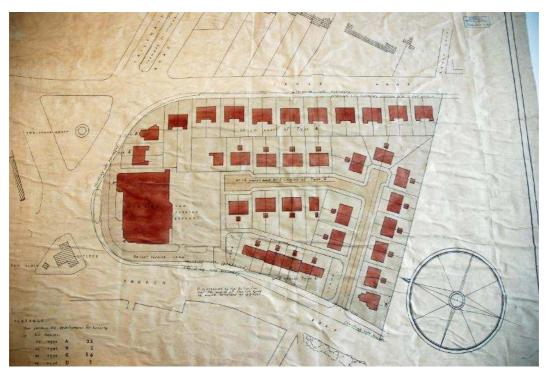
Image of a site plan layout showing the proposed cinema and 66 houses, laid out in a very similar manner to the existing housing. (Source: Liverpool Record Office CE7726)
